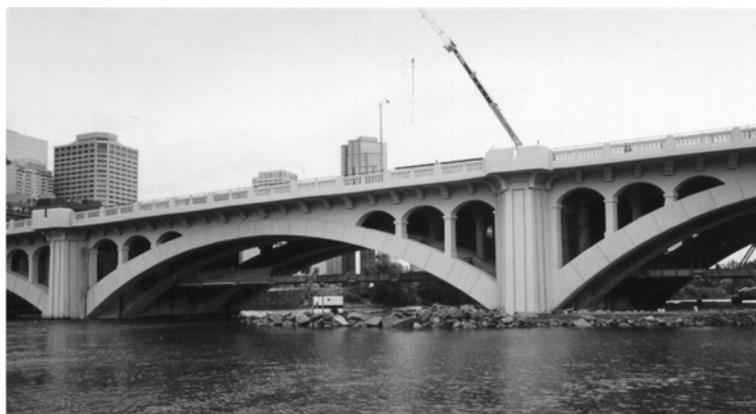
The Centre Street Bridge, Calgary, showing the lower deck (the deck that was monitored) under reconstruction
